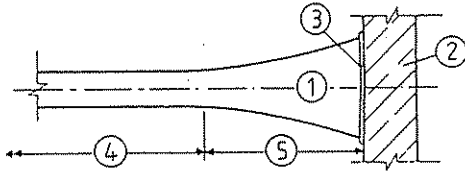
Embankment dam with internal sealing of asphaltic concrete. Junction of the membrane and a lateral structure, horizontal section (adapted from Haug & Rothacker 1989).
